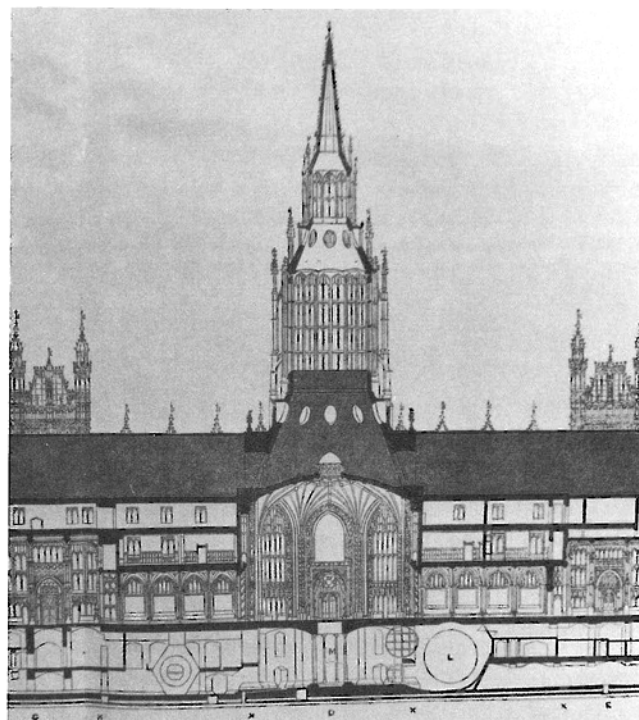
London, Houses of Parliament, 1840-1865, longitudinal section through central tower showing heating and ventilation spaces (*Building News*, 31 December 1858).
